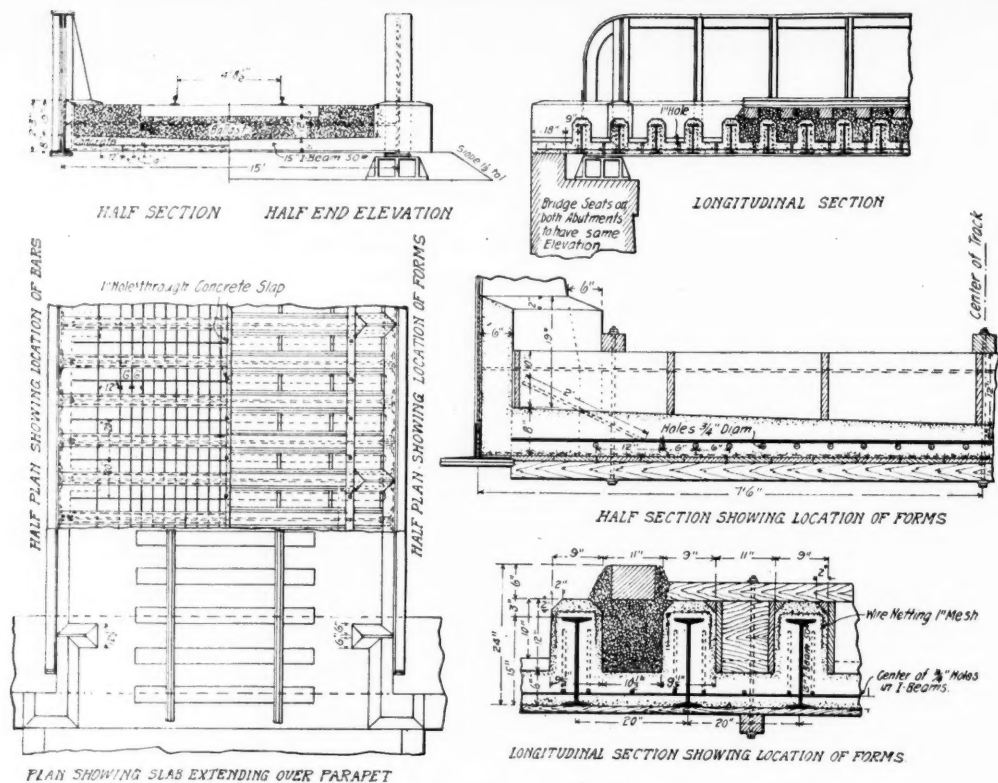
STANDARD REINFORCED CONCRETE FLOOR FOR THROUGH GIRDERS, "DESIGN B," WABASH R. R.
